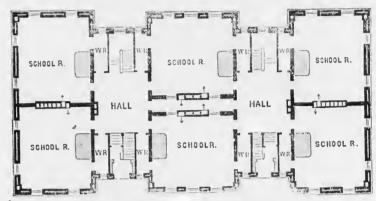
PLAN OF FIRST, SECOND AND THERD FLOORS OF DESIGN NO. 57.
